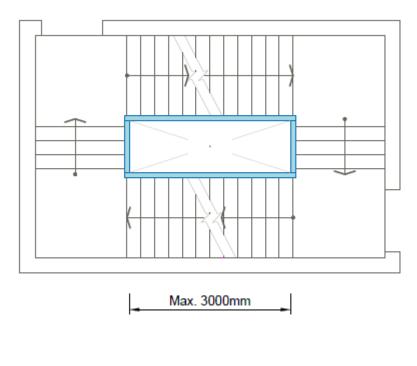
Dual wall system with vertical wall between horizontal walls – vertical Speedpanel base detail at mid-landings
